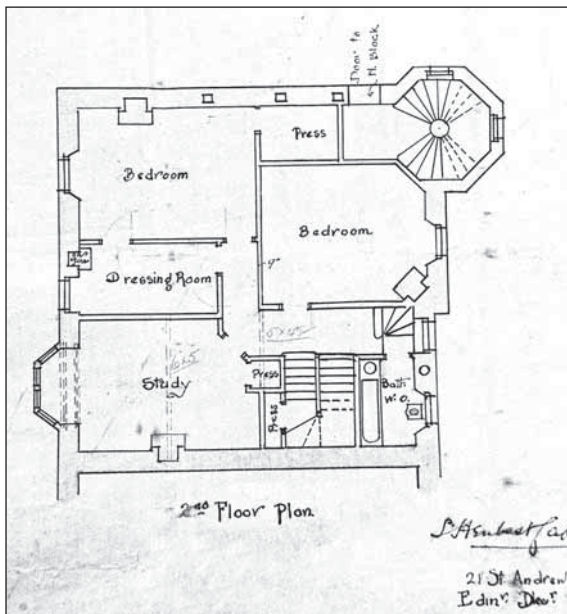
Second floor of the Ogilvie house with bedrooms, study, dressing room, bath and water closet. The study window is clearly for looking out over West Princes Street Gardens. (ECA, Dean of Guild petition, 11 January 1893.)
